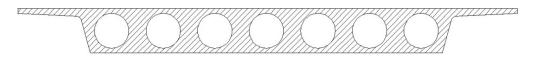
H(1) - PRESTRESSED CONCRETE VOIDED SLAB WITH LONGITUDINAL VOIDS
